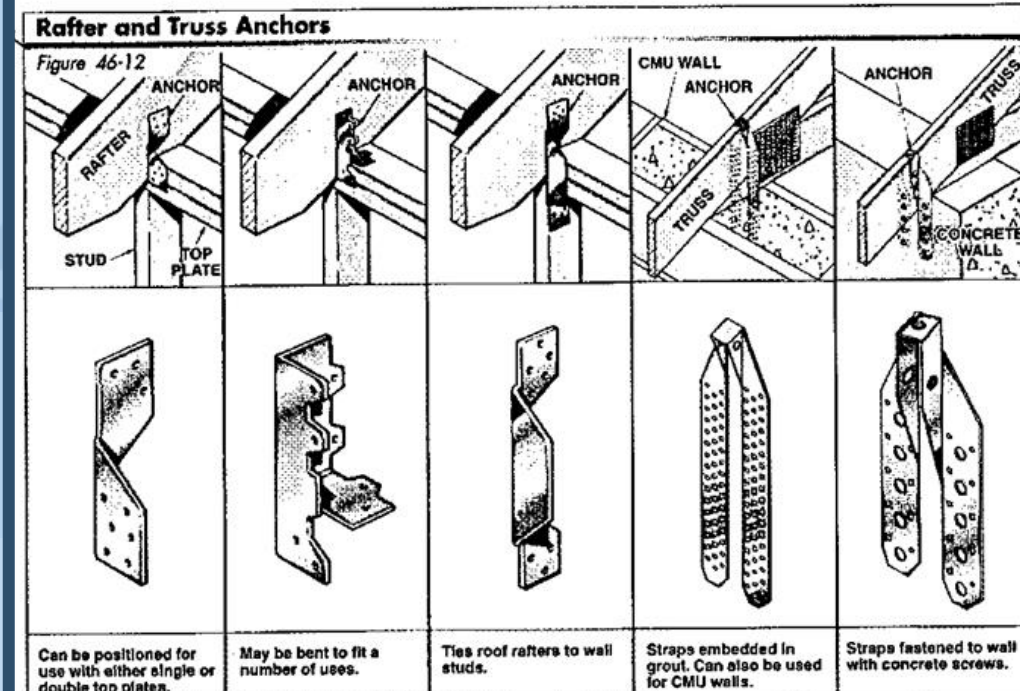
Rafter and truss anchors tie rafters and trusses to the building walls.
